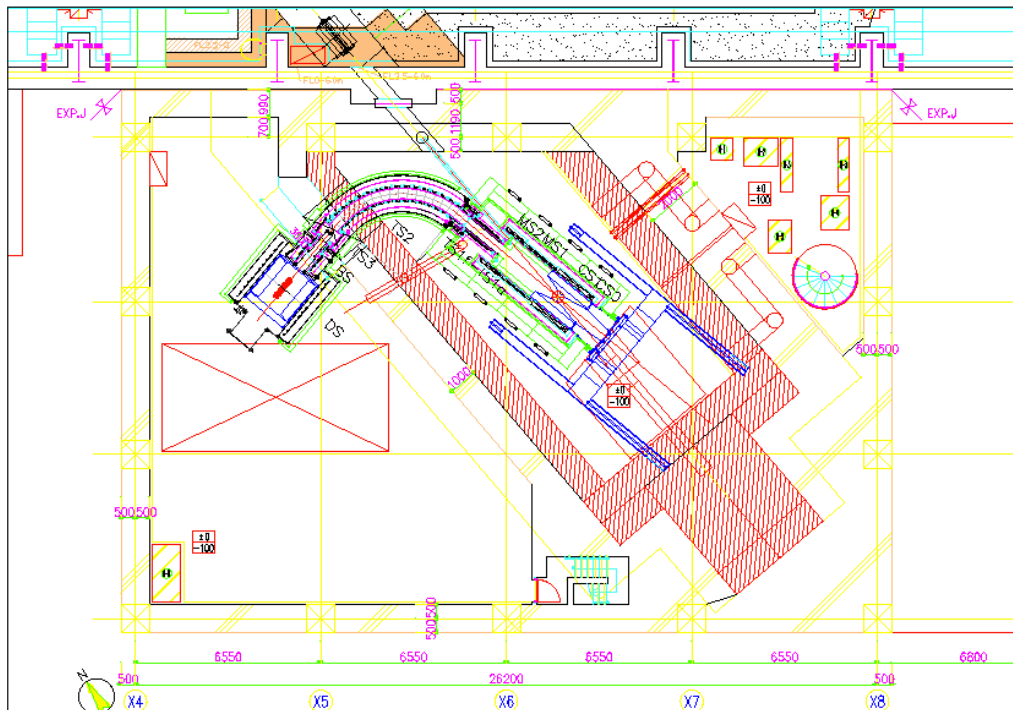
The layout of the basement level of the COMET building that will house the beamline, target and pion capture solenoid, muon beam line, muon stopping target and detectors.
